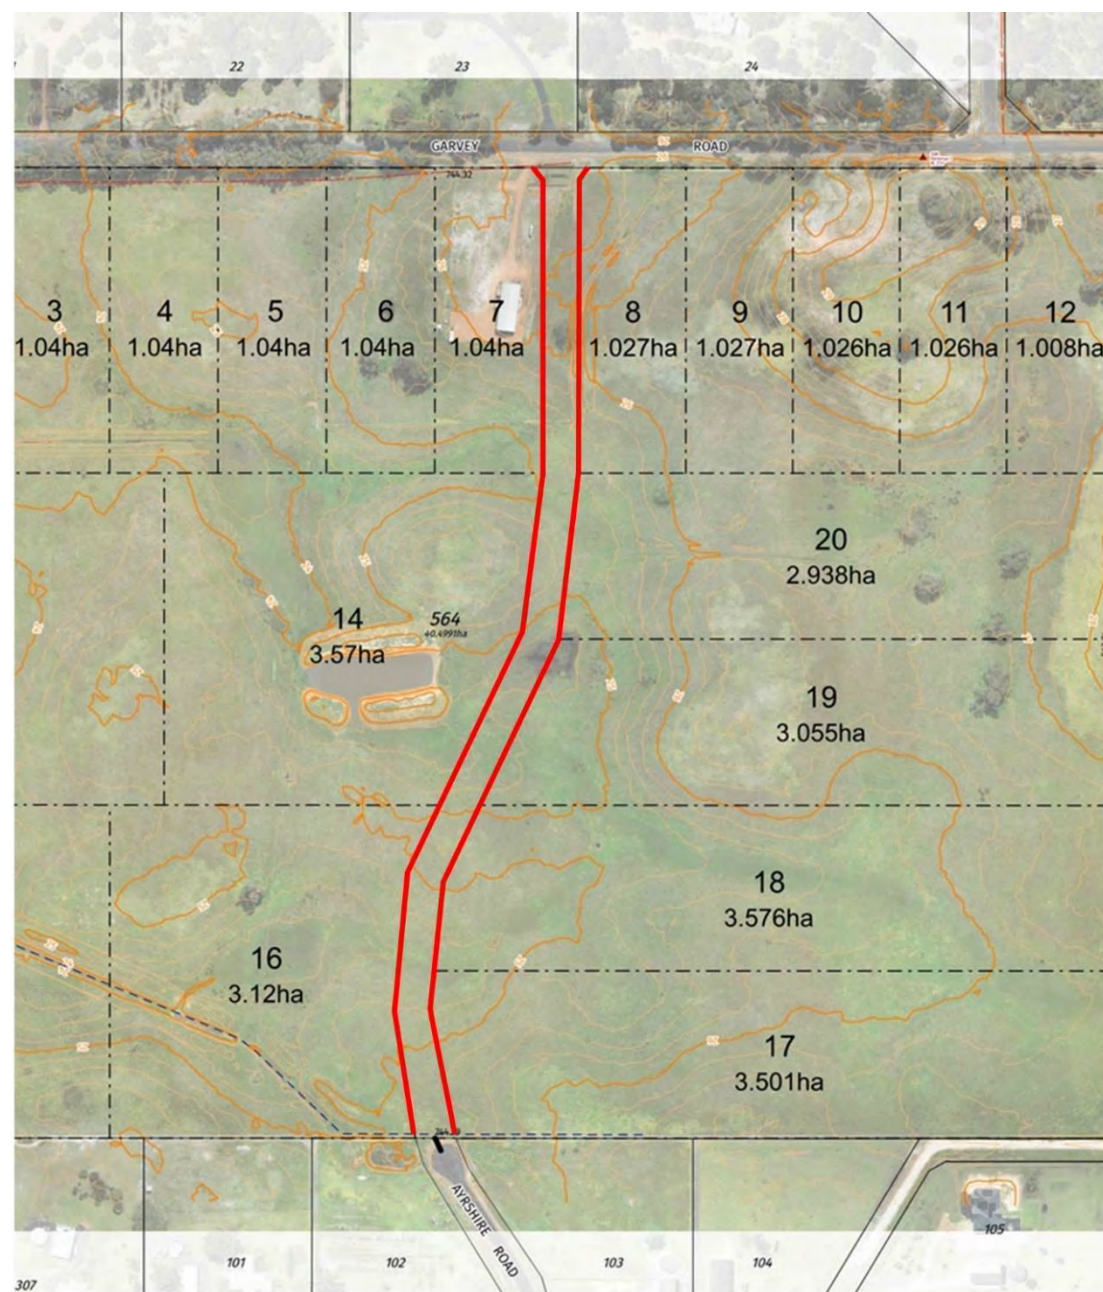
New subdivision road connecting Garvey Road through to Ayrshire Road (source: Harley Dykstra, June 2024)
